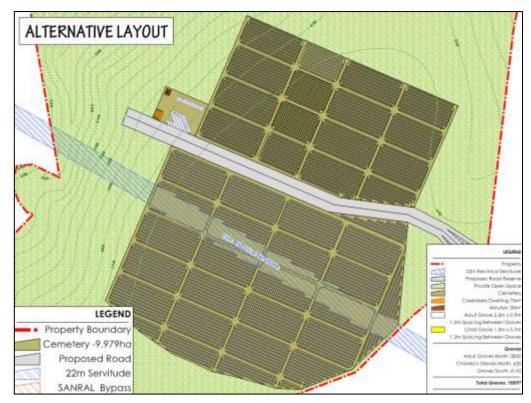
ALTERNATIVE LAYOUT PLAN
